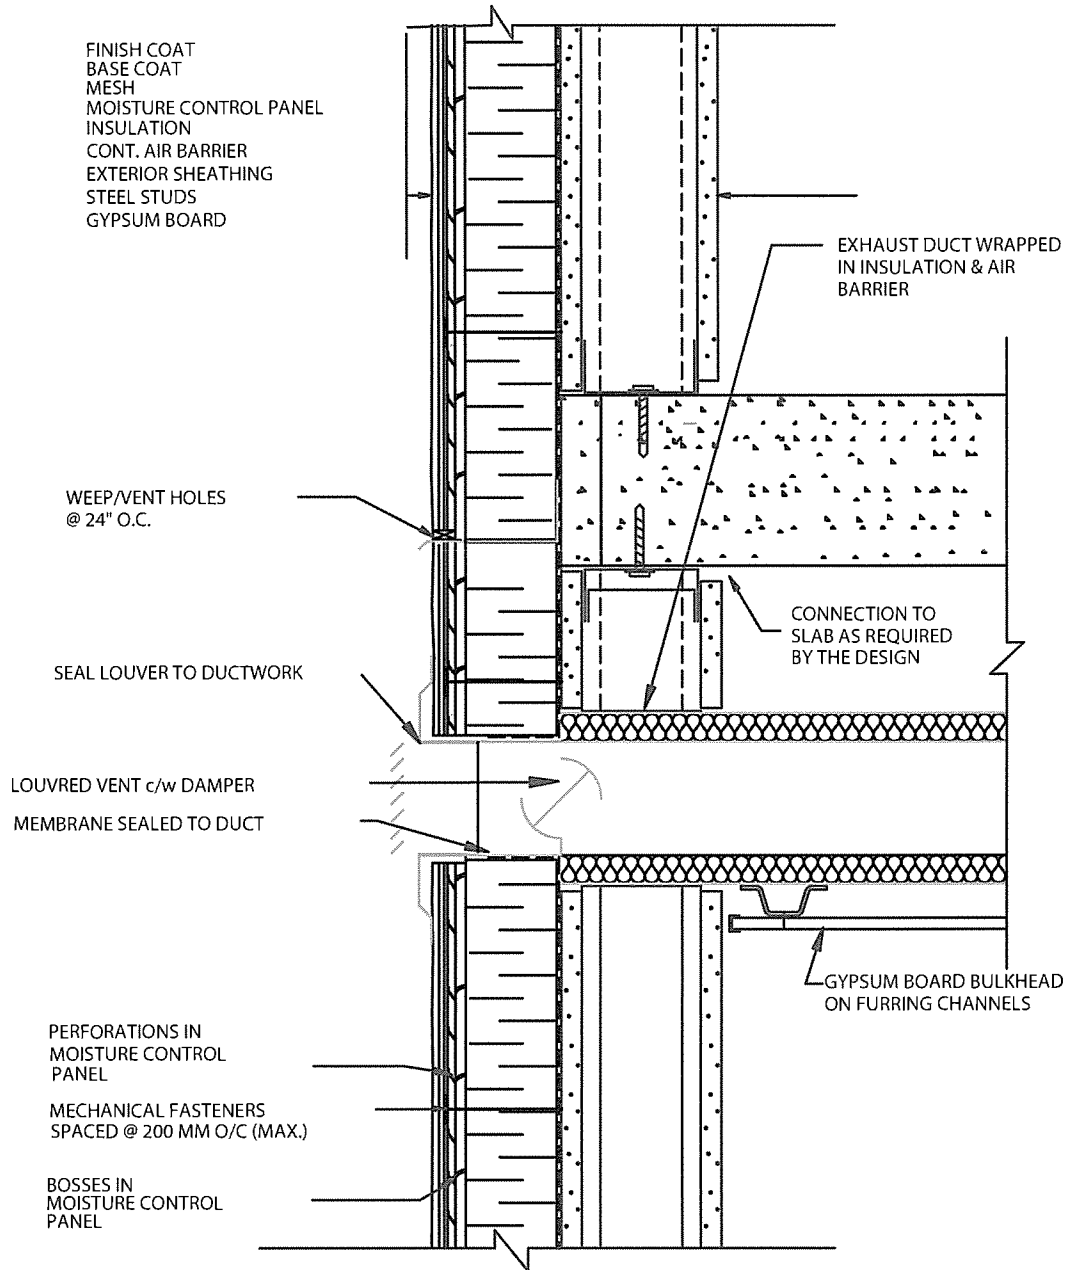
ACRYLIC STUCCO/ STEEL STUD
